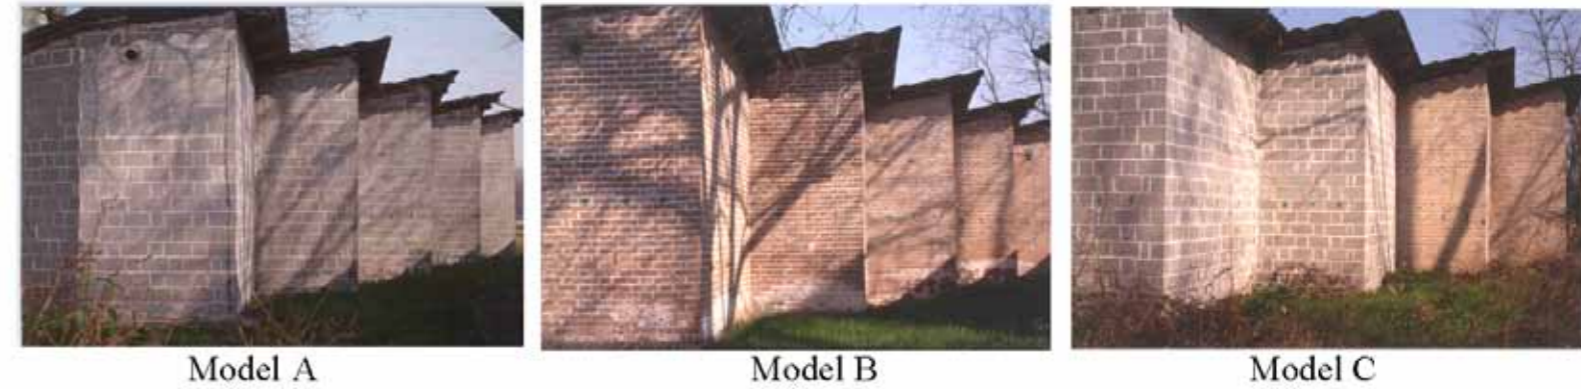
Three full-scale masonry models in Milan, view of the west and south walls. Source: Polimi.
